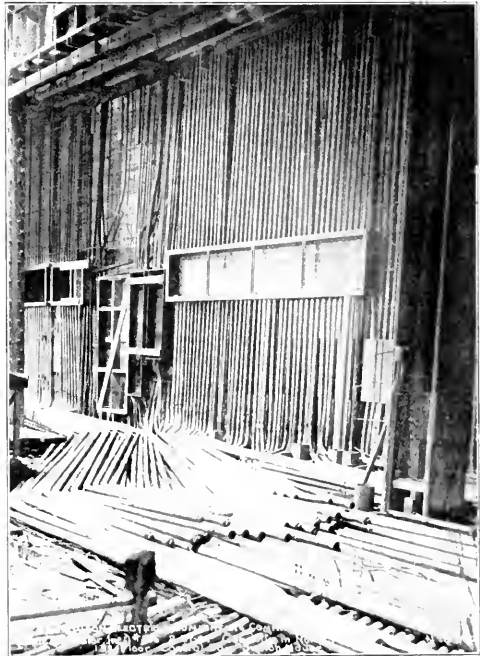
CONDUITS IN FLOOR AND WALL OF CONTROL BAY
